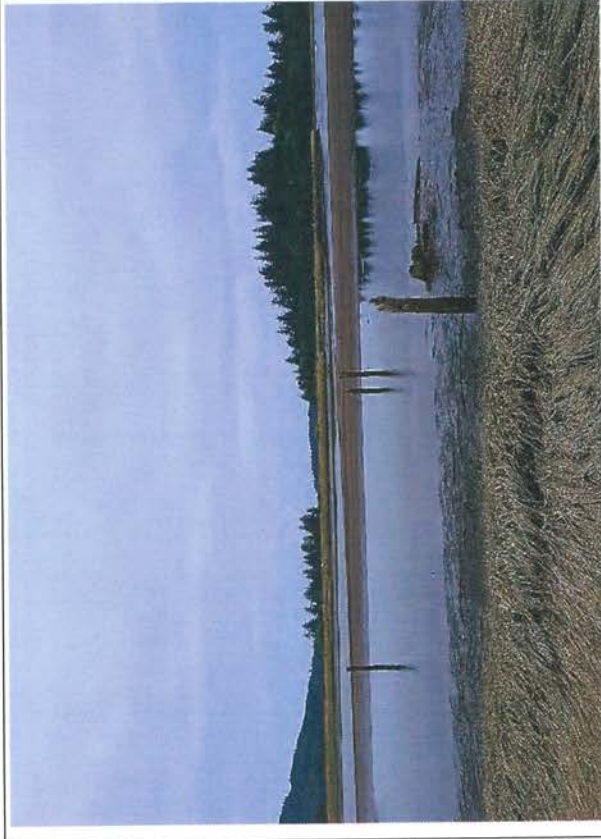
, Photo 2: Facing east, eroded and overgrown dike.
